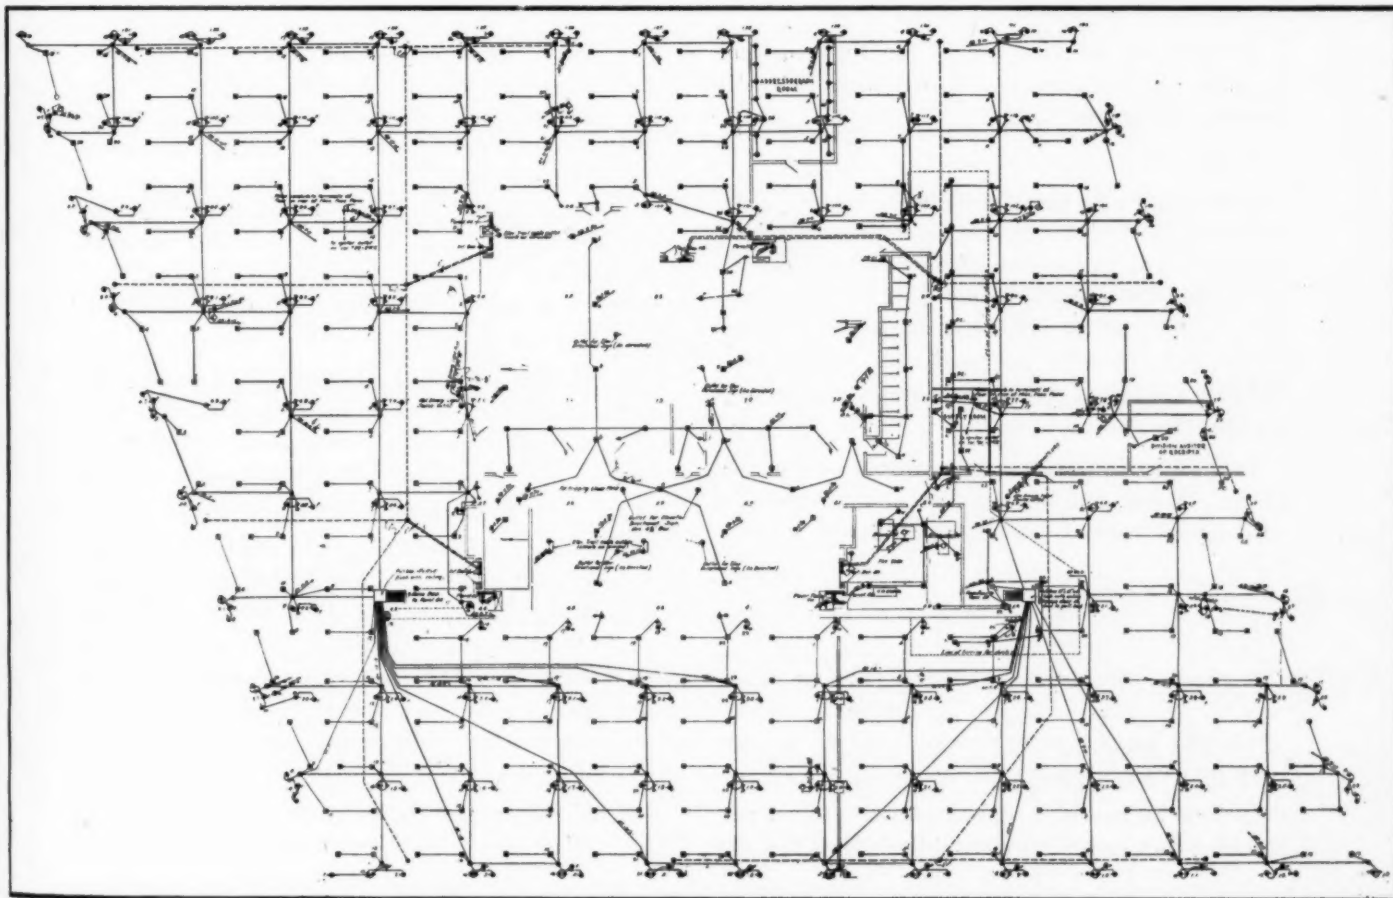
"Grid" Distribution—Ceiling of Typical Floor
